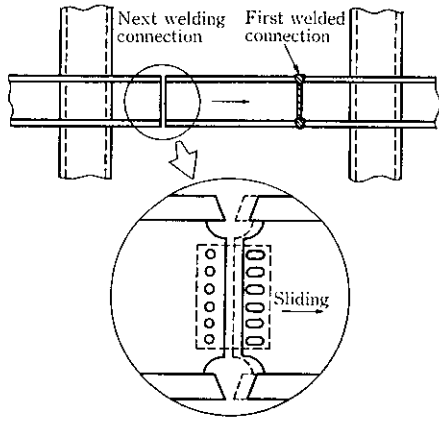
Consideration to shrinkage of girder-to-girder connection due to welding
